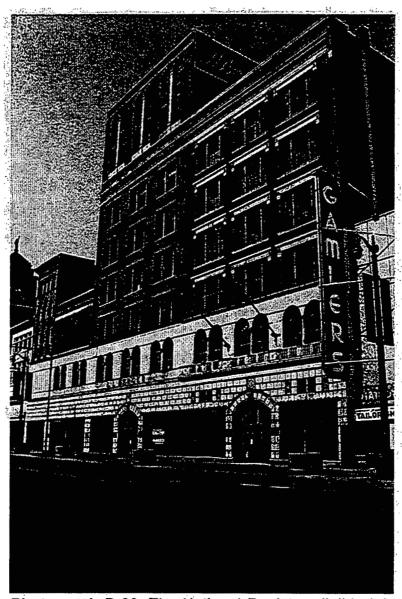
East elevation of 478 Main Street, facing southwest (PCI 2001).
